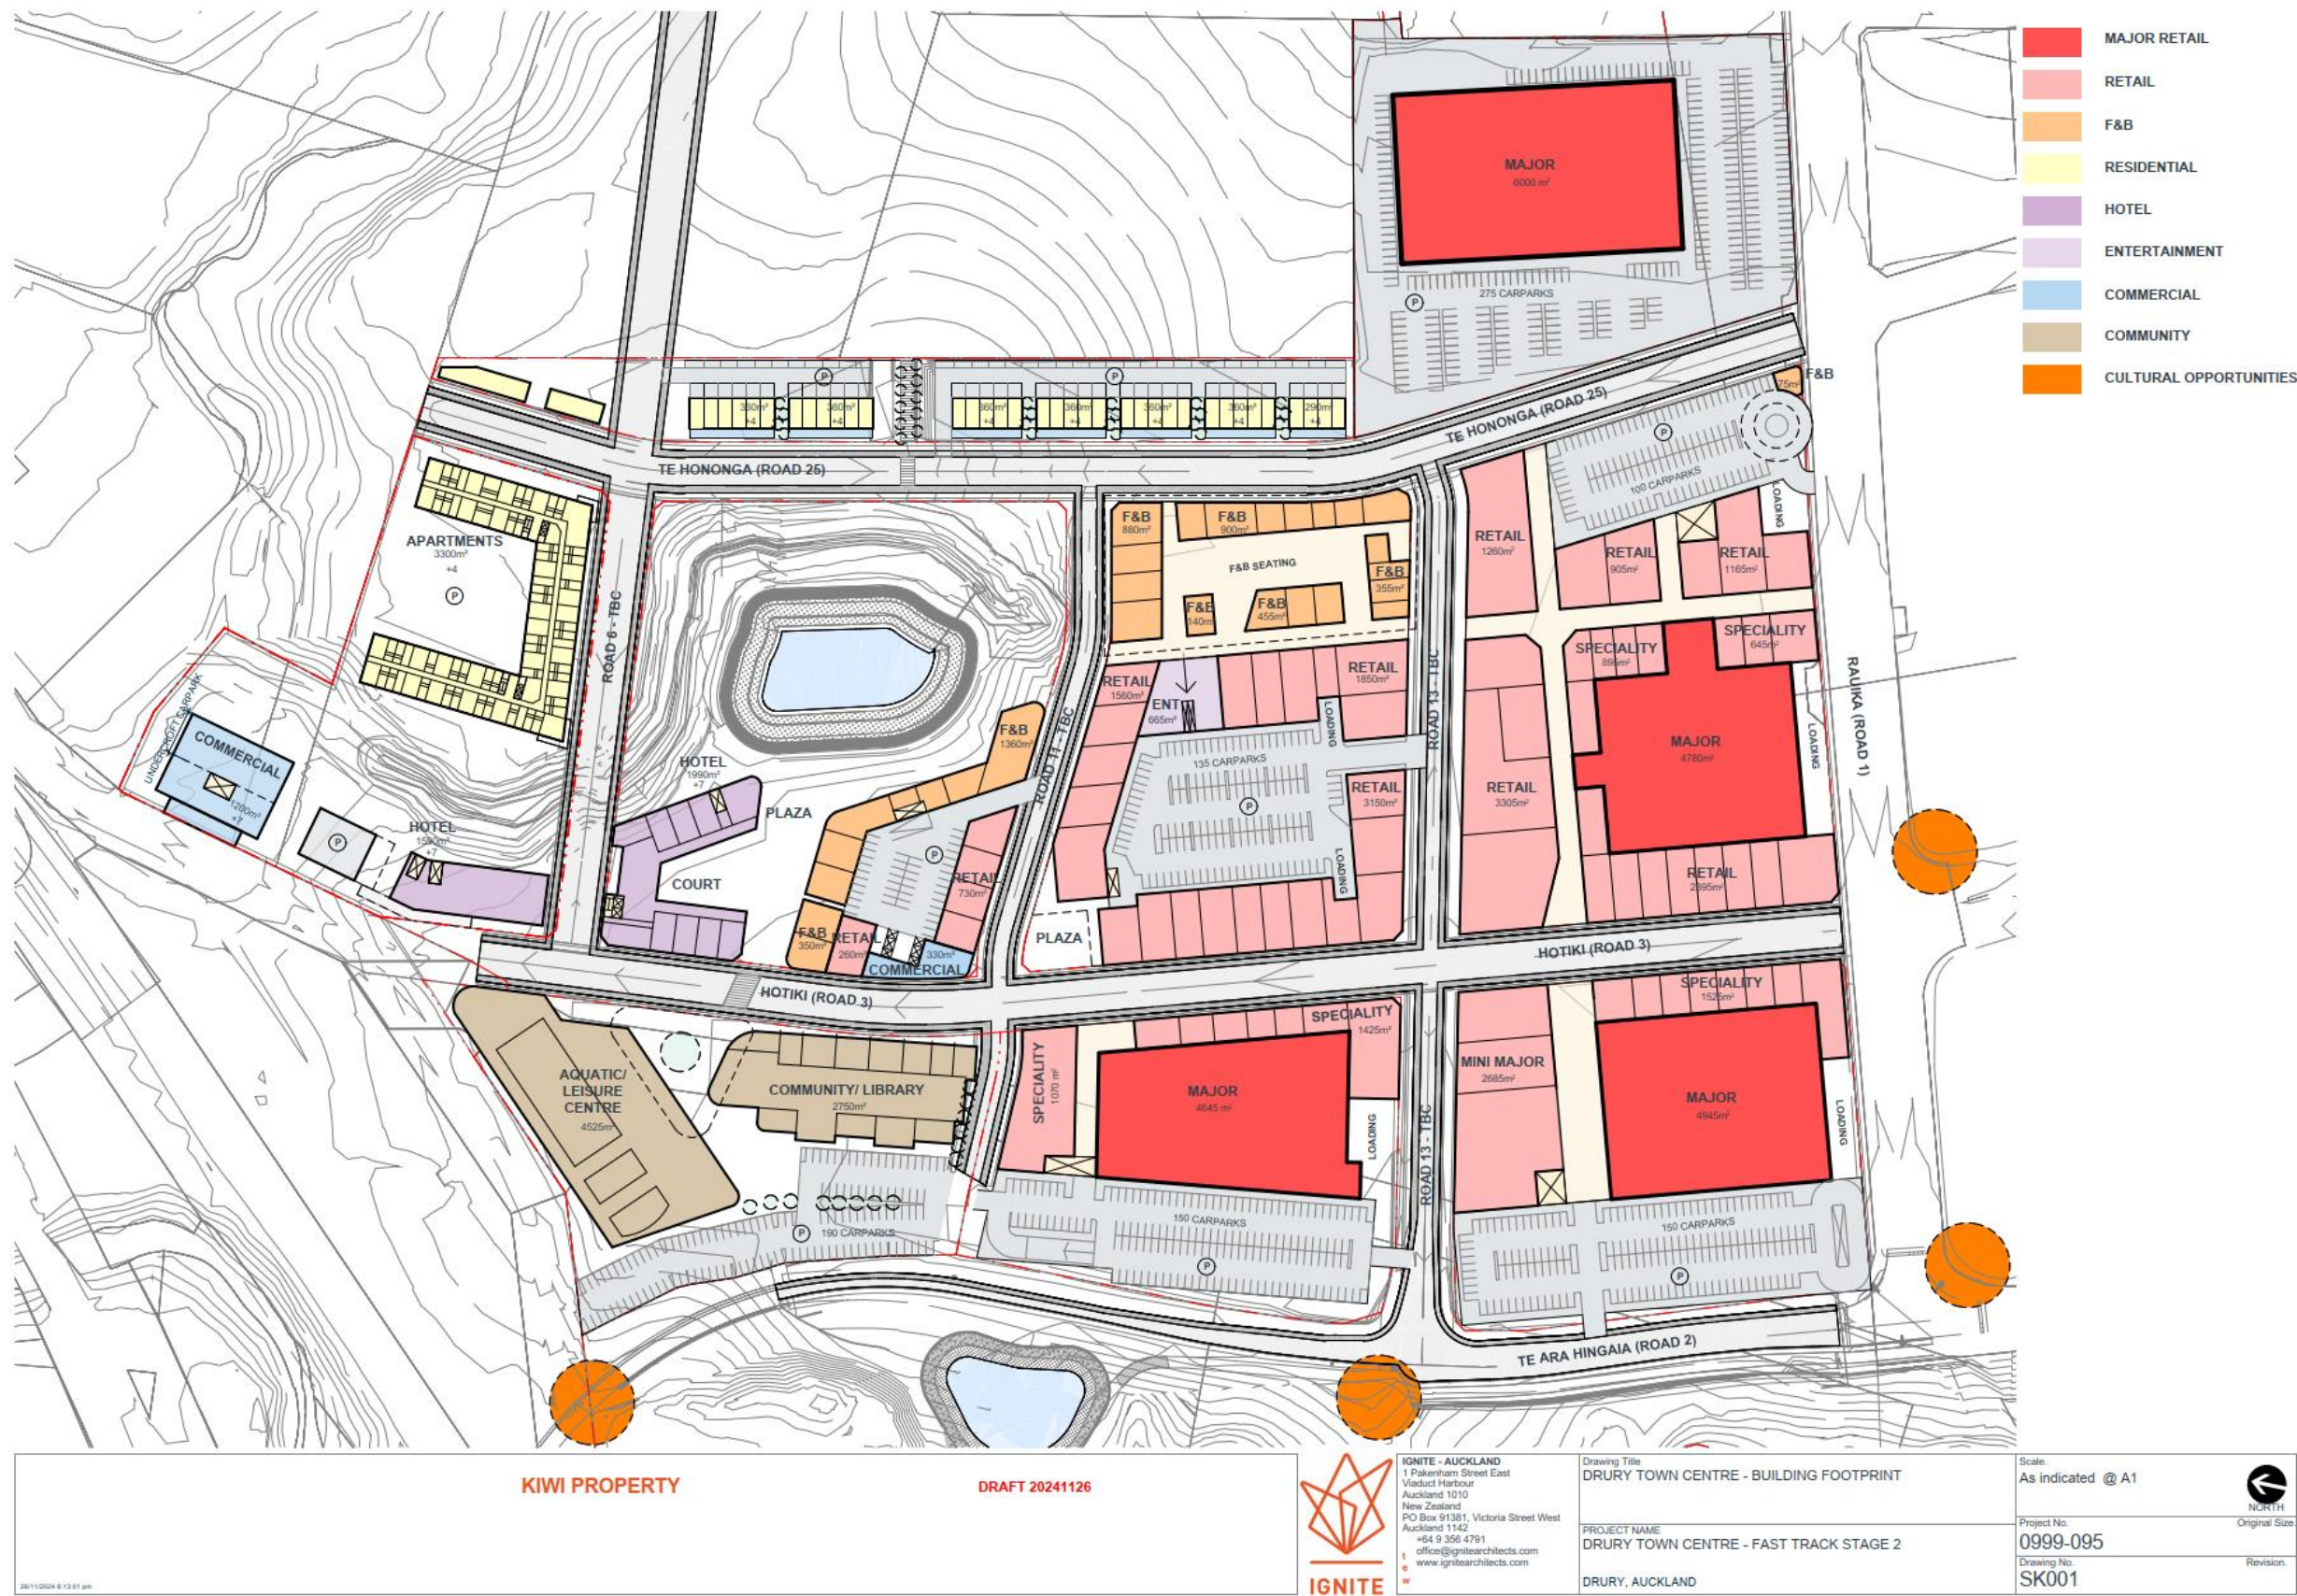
Site Plan (used for Stage 1 residential demands)
